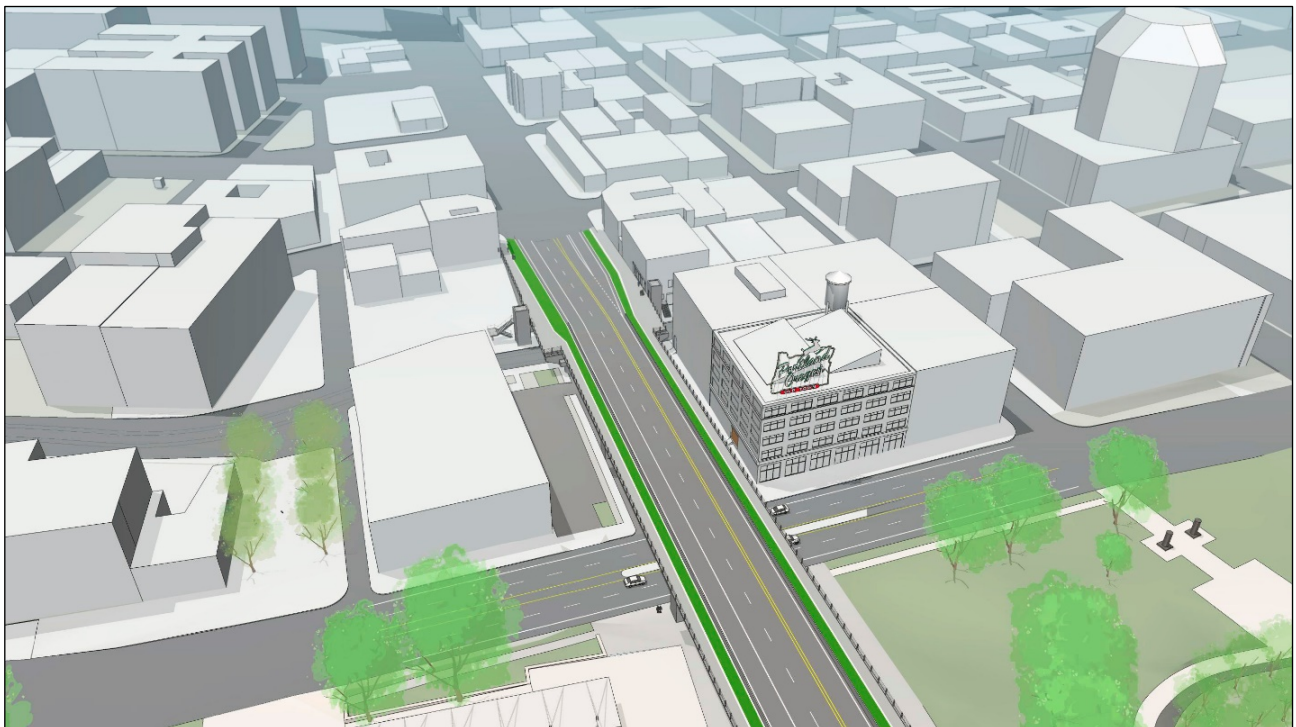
Artist's rendering of replacement west approach span, aerial view looking northwest (Fat Pencil Studio, 2021).
